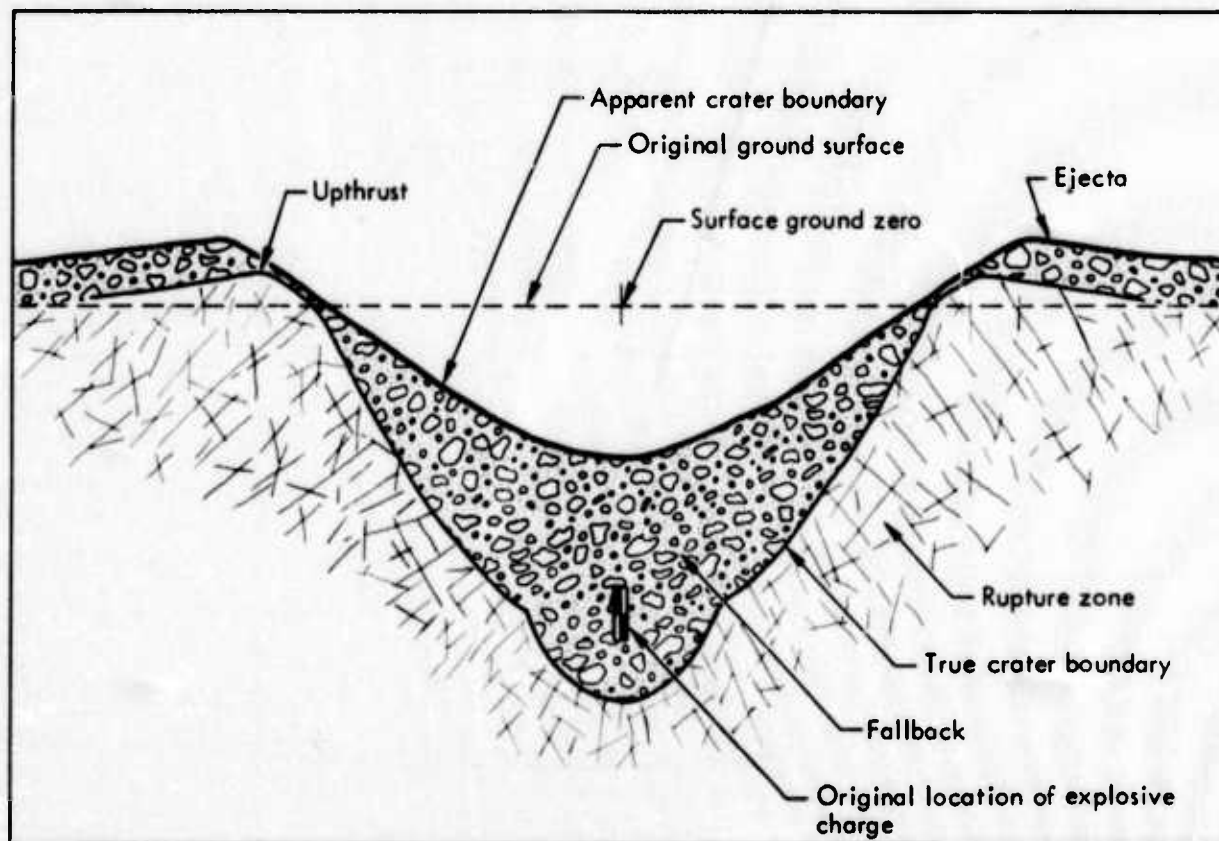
Cross section of typical crater in rock, showing nomenclature.¹
